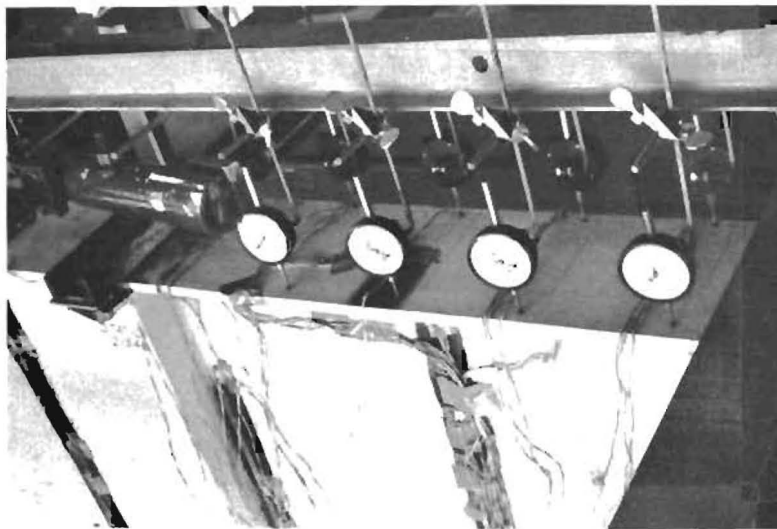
Dial Gages Used to Measure Compression Flange Rotation
